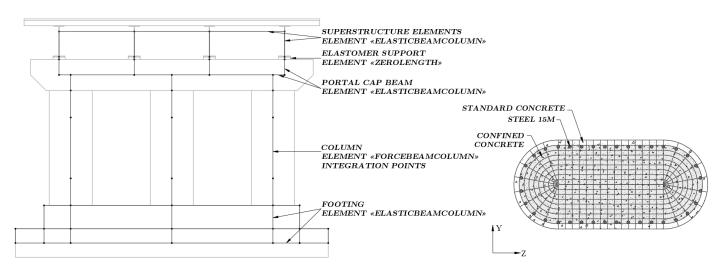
Discretization of the elements of the bridge bent and transversal section of a column.
